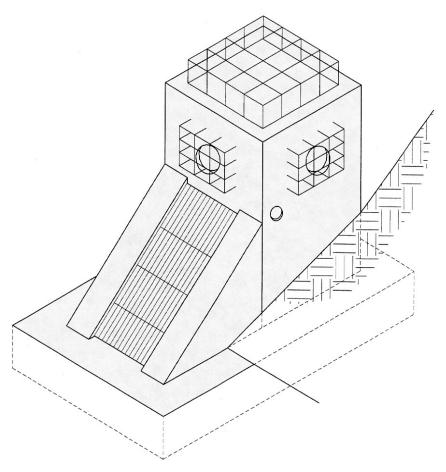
Example of Various Trash Racks Used on a Riser Outlet Structure (Source: VDCR, 1999)
